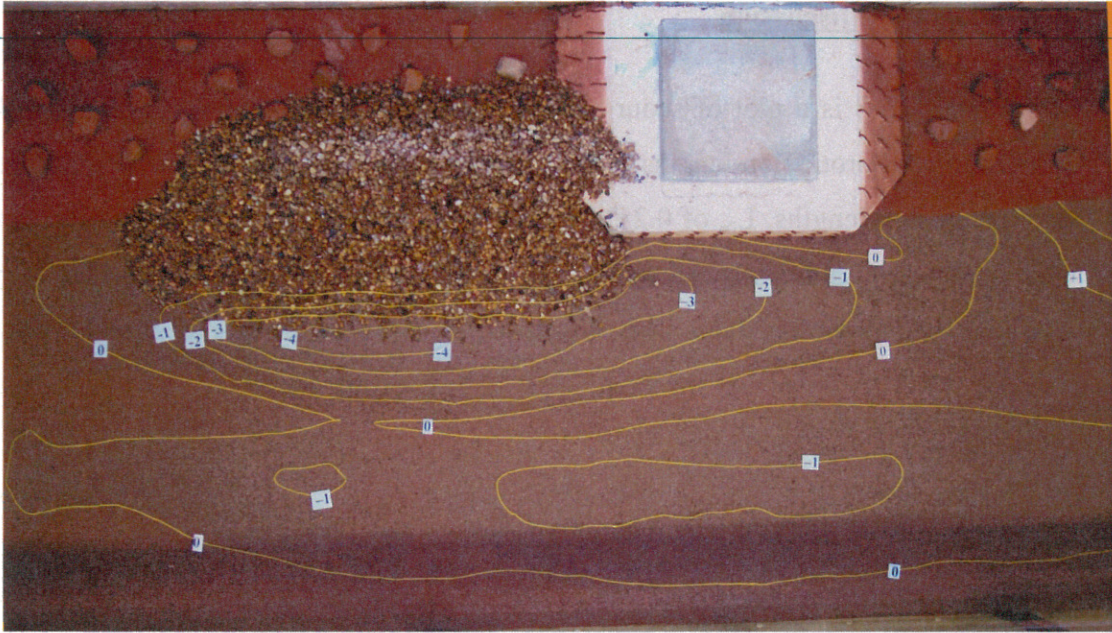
Scour contour of test No 6. in Table 4 with gravel diameter 6.7~9.5 mm, 1.5L length, rock wall end slope H:V=30/13.2, side slope H:V=18/13.2, a small apron at the end . Wall base protruded out into main channel from abutment a quarter wall width. $y_m = 13.2$ cm, $y_f = 5.2$ cm, $Q = 0.0373$ m³/s, $t = 4800$ min. Flow from left to right.
